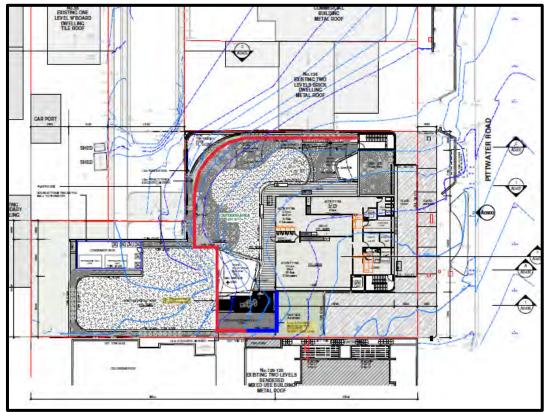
Proposed Floor Plan level 2 – with the barriers as required.
